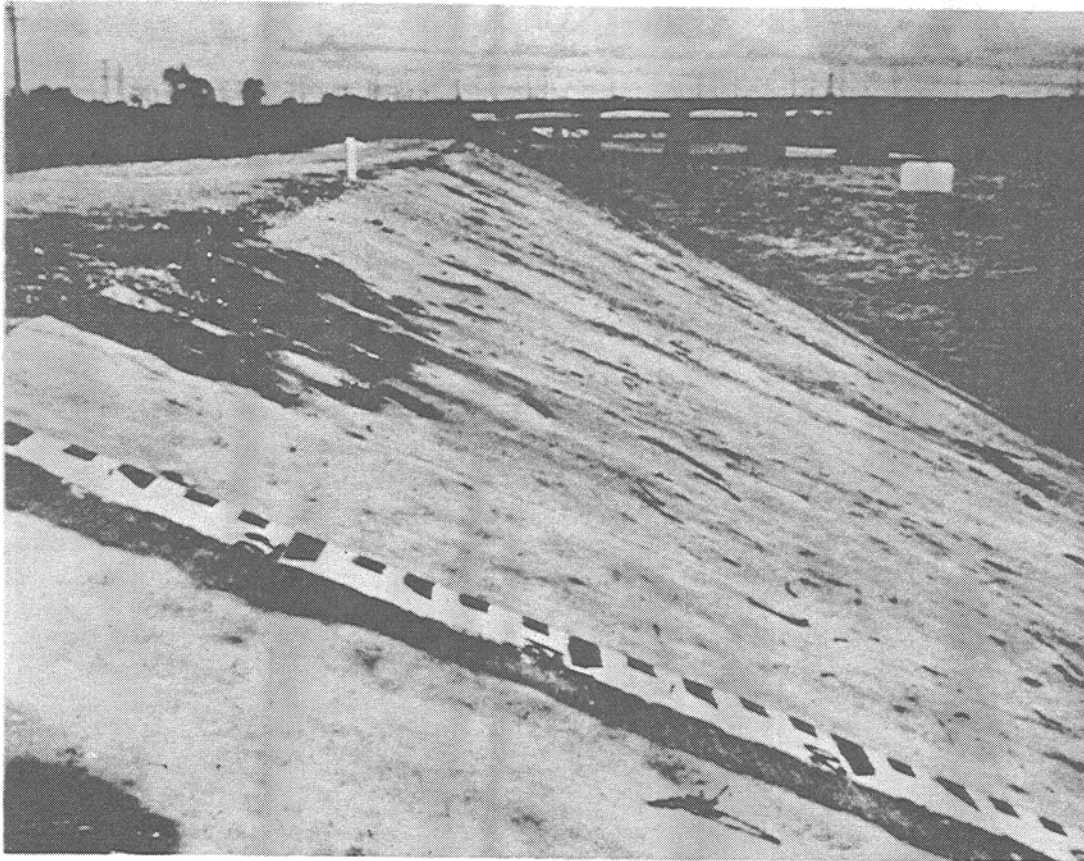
Aftermath, Flood of 16 February 1980, Los Angeles River below Wardlow Road, Long Beach (view toward downstream, showing debris at top of levee left by flood).
